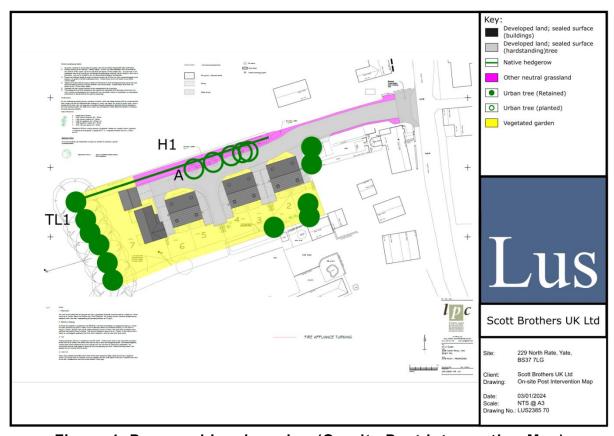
Proposed Landscaping (On-site Post Intervention Map)
